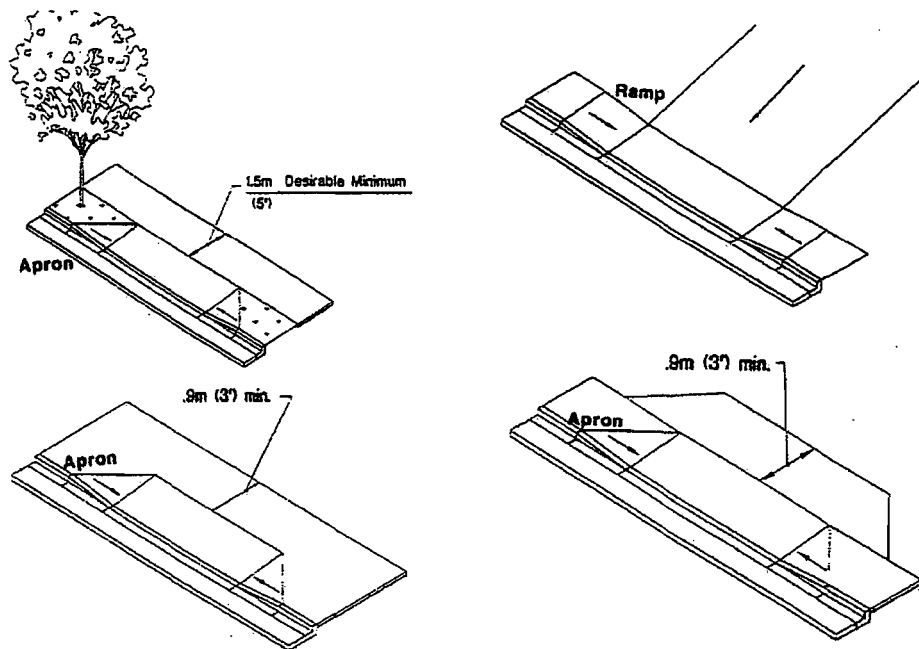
Figure A Examples of Acceptable Driveway Openings Next to Sidewalks/Walkways
